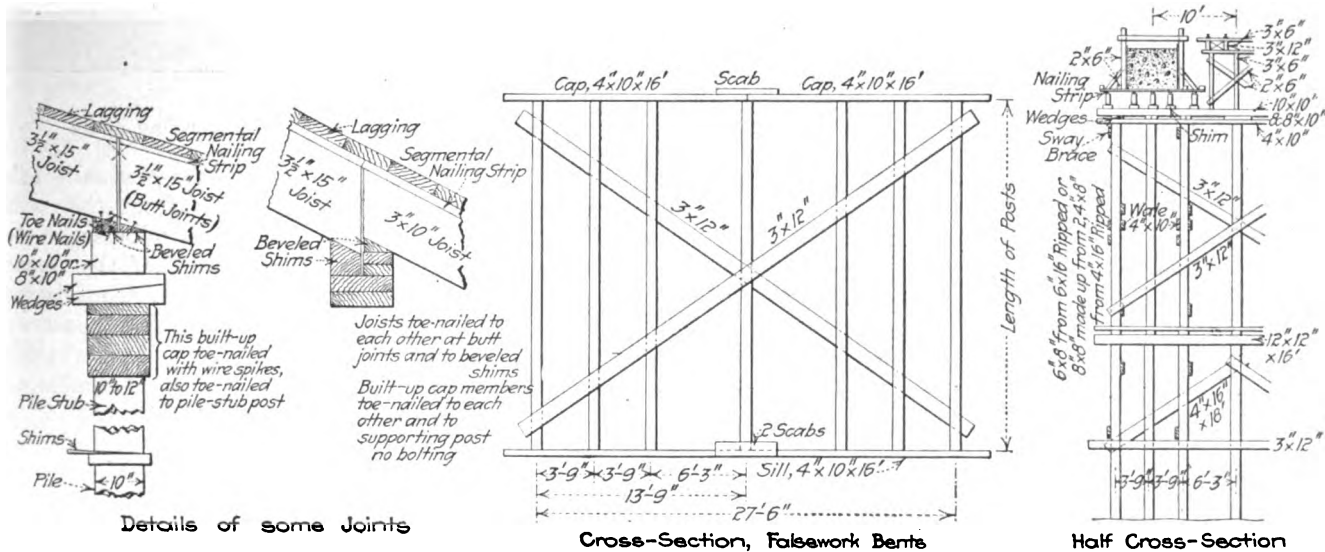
DETAILS OF THE FALSEWORK DESIGN OF POST ST. BRIDGE AT SPOKANE
